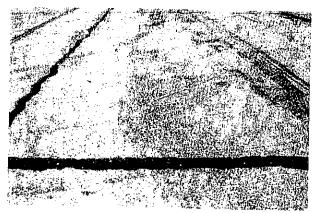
Low-Severity Joint Reflection Cracking, Filled Crack
